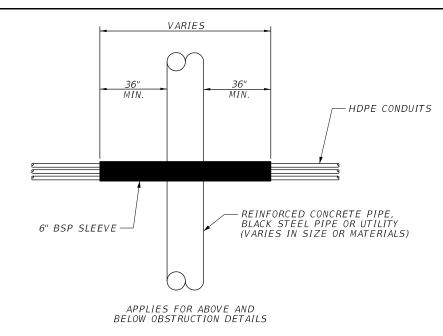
DETAIL "B" TYPICAL BSP SLEEVE TRENCH DETAIL TO ABOVE CROSS OBSTRUCTION
